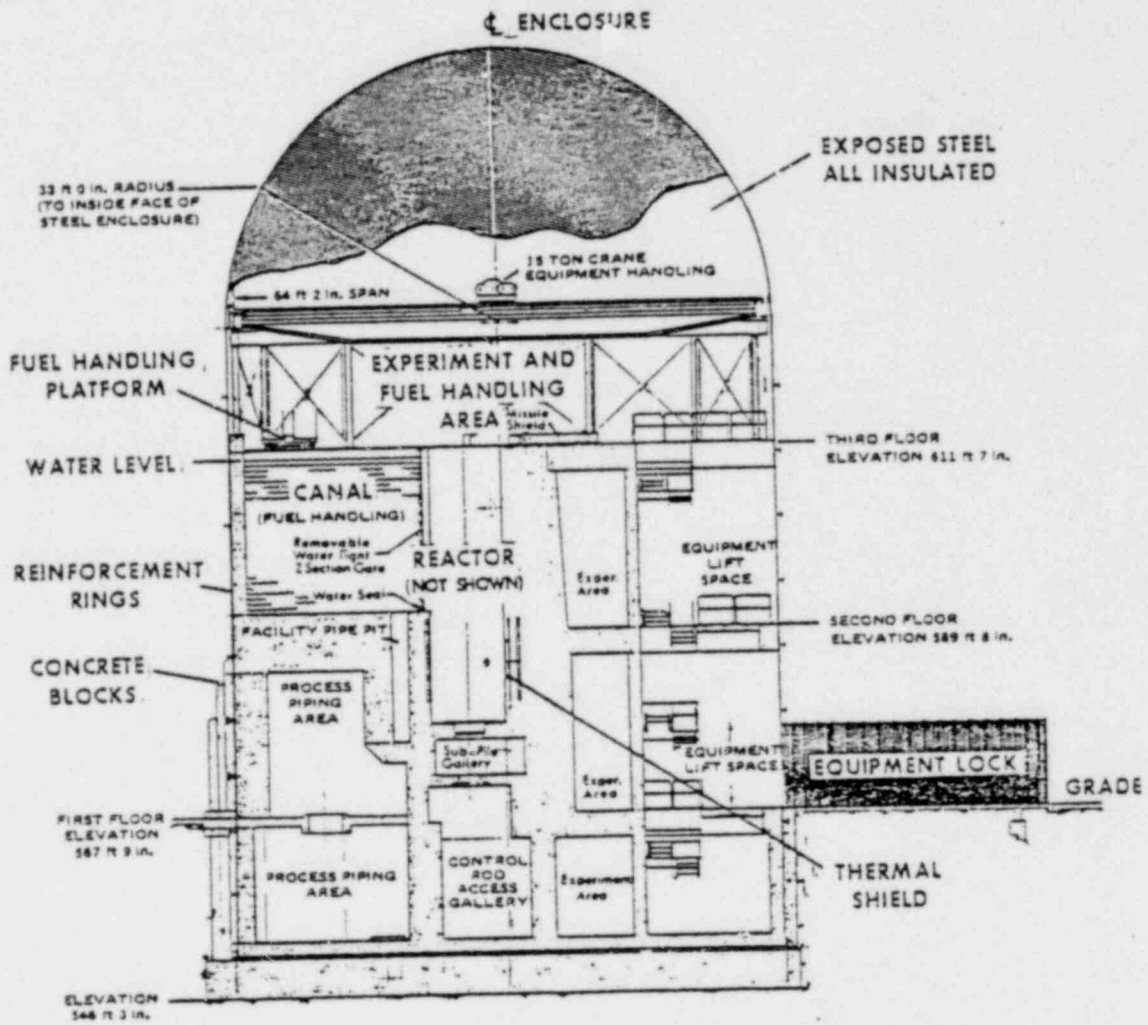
REACTOR BUILDING CENTERLINE SECTION
